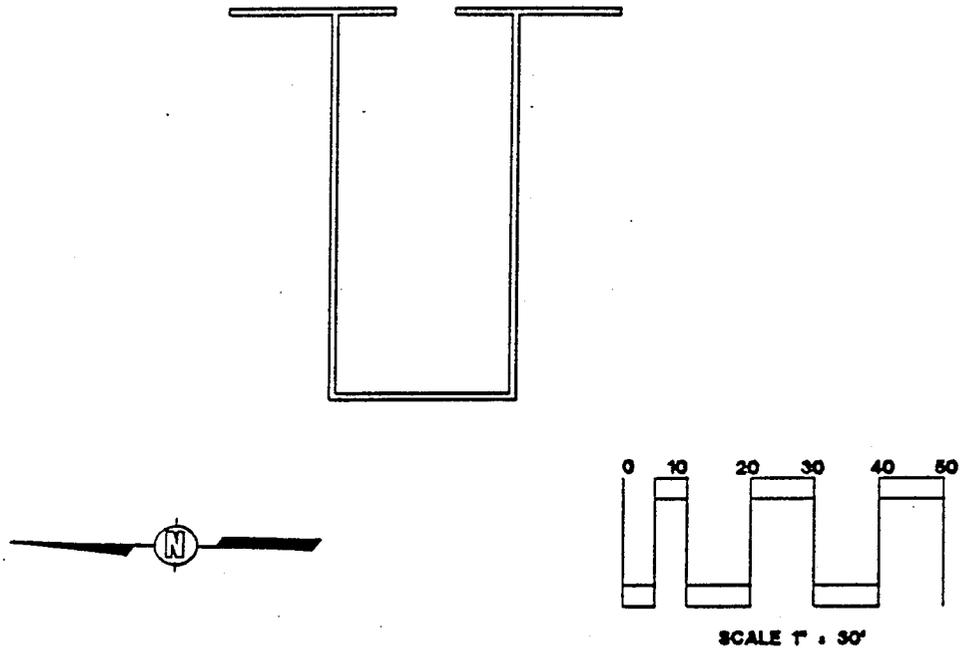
BUILDING 6007, 6000 IGLOO STORAGE AREA
